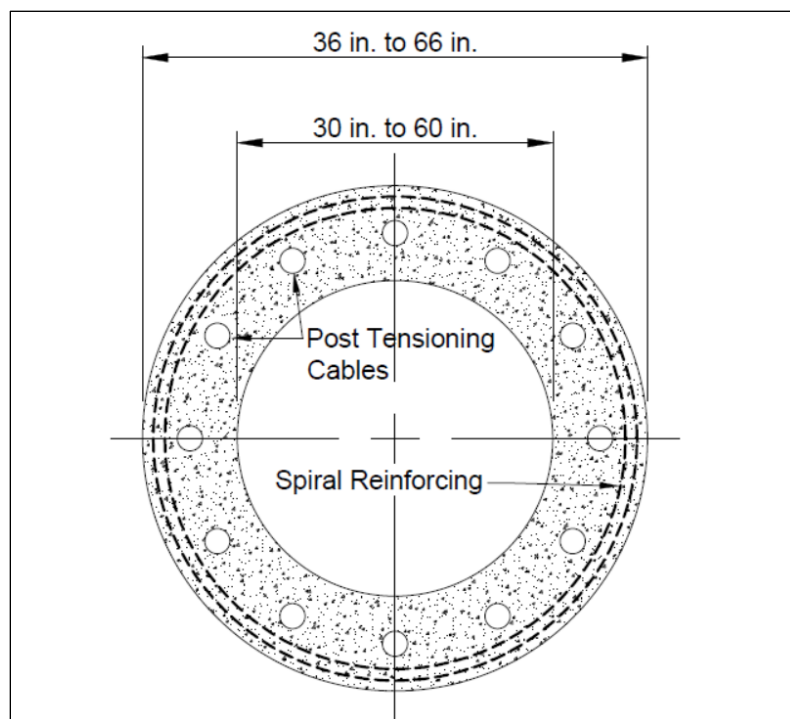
Typical spun-cast concrete cylinder pile section.
